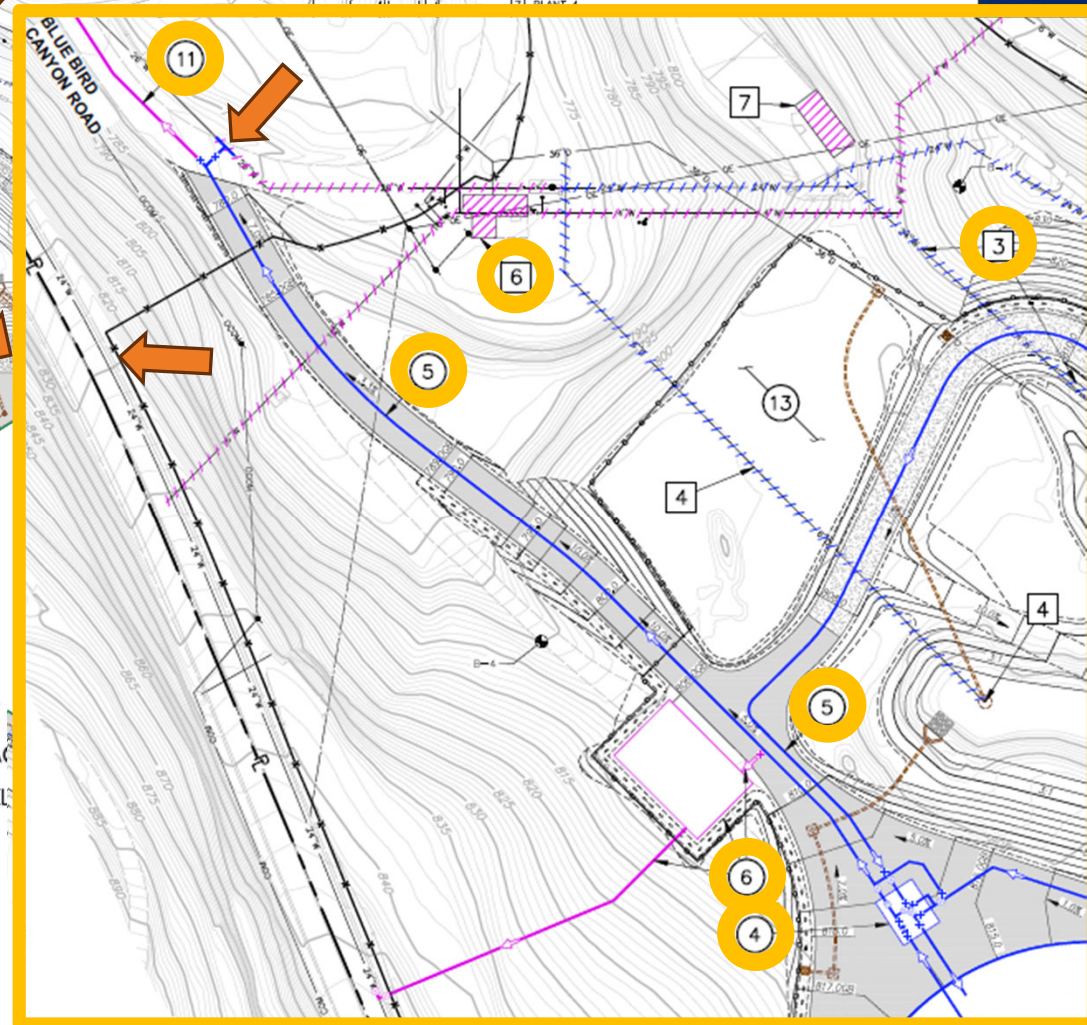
ALTERNATIVE 1 SITE PLAN
